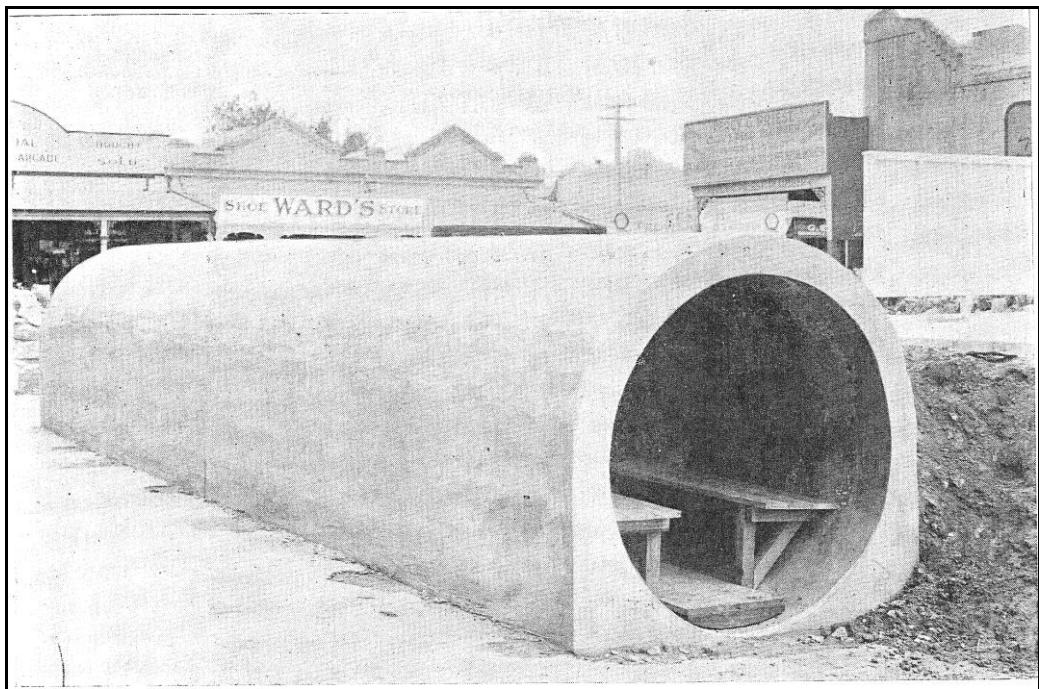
A Pneumatic Core Concrete Shelter installed above ground at Norwood
